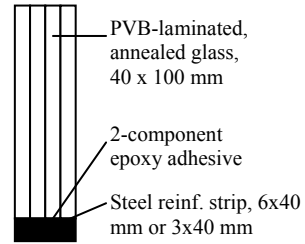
Steel reinforced glass beam concept by Nielsen & Olesen.
